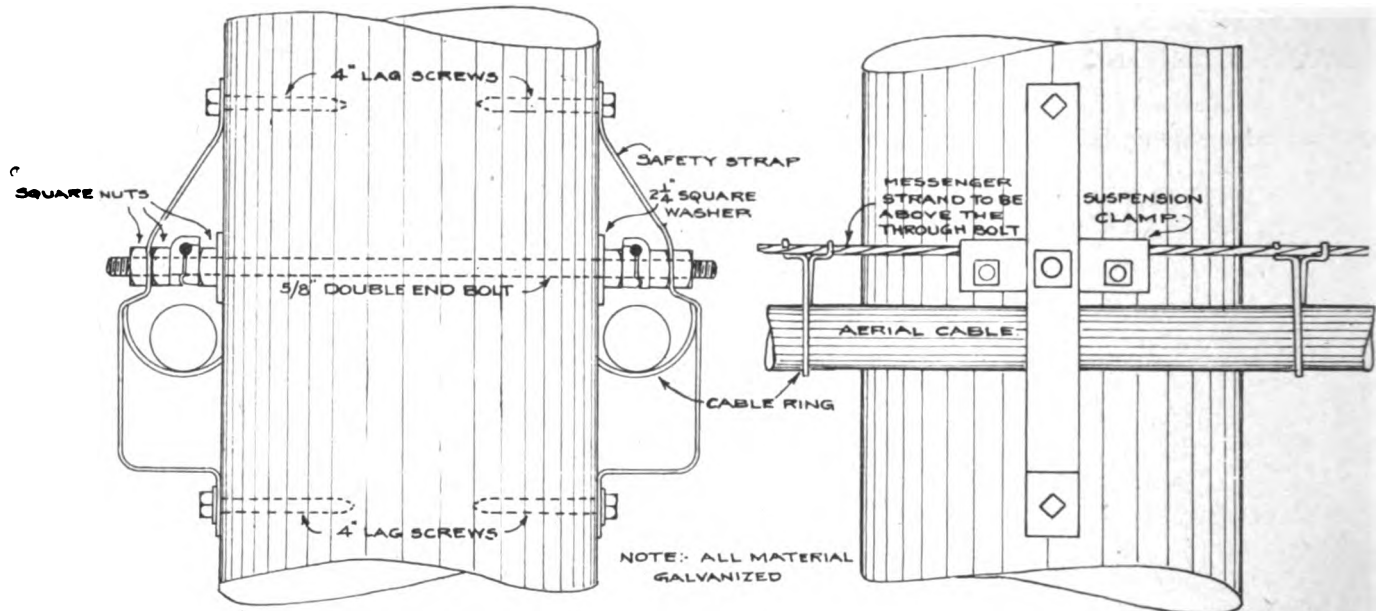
DOUBLE END BOLT AND SUSPENSION CLAMP FOR SUPPORTING MESSENGER ALSO SHOWING SAFETY STRAP.
